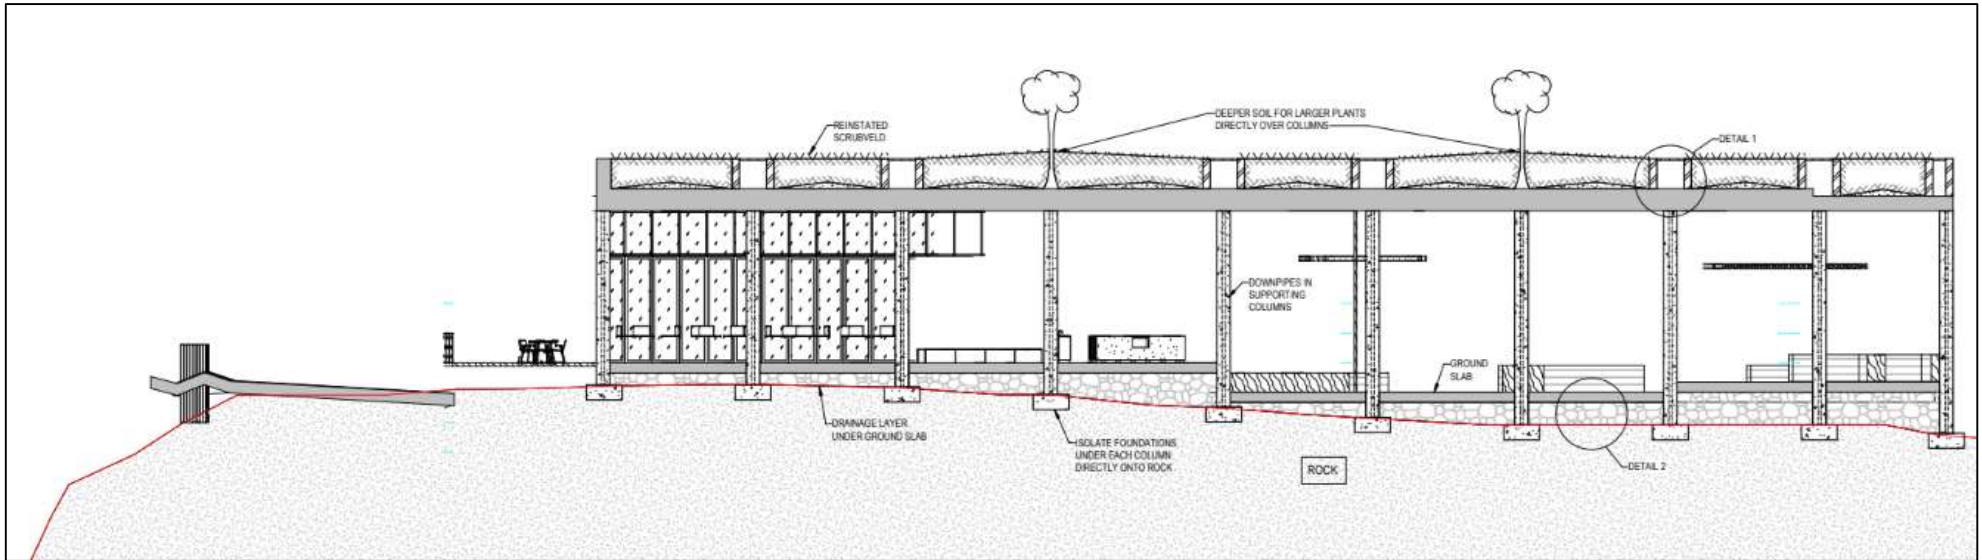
Visitor Centre _ Concept of roof planting and building drainage system
